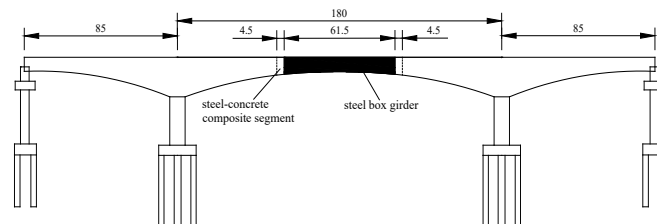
Plane view of Hanzhuang Grand Canal Bridge (unit: m)
